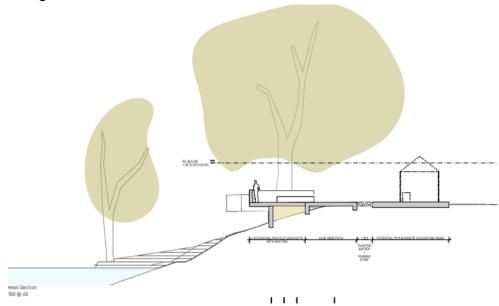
Cross section of Option 2 at a lookout point, showing integration of existing walkway and protective retaining wall structure.
